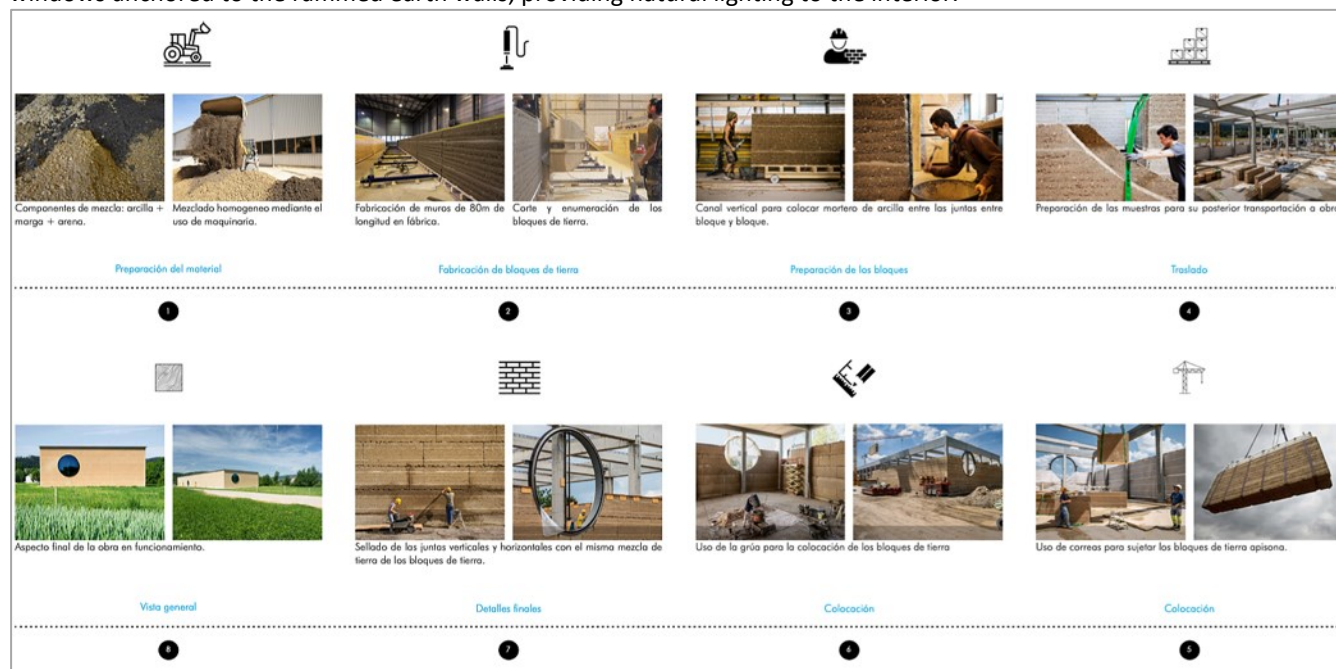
Construction process of the building Ricola Kräuterzentrum
